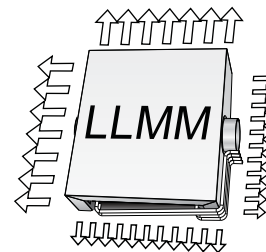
Example of nozzle setting for a single-module unit - LLMM
